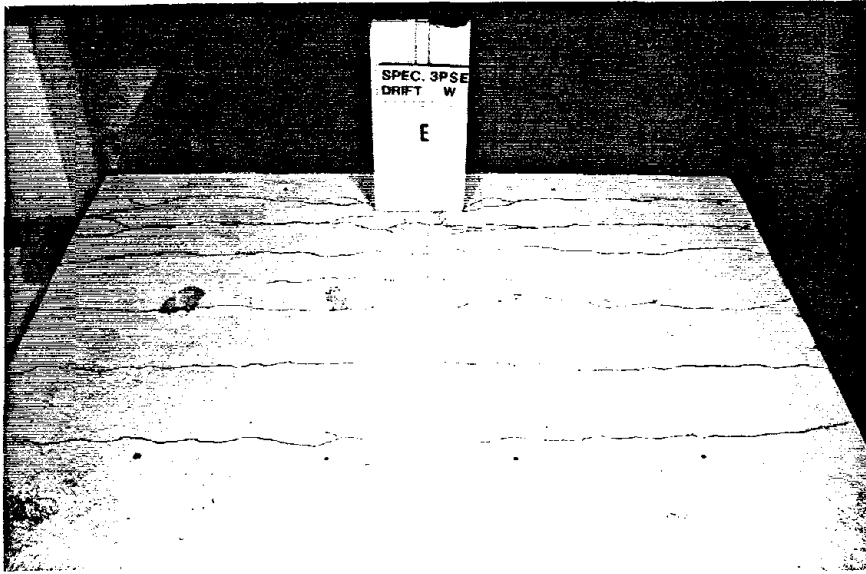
Specimen 3SE - Exterior connection crack pattern after test
